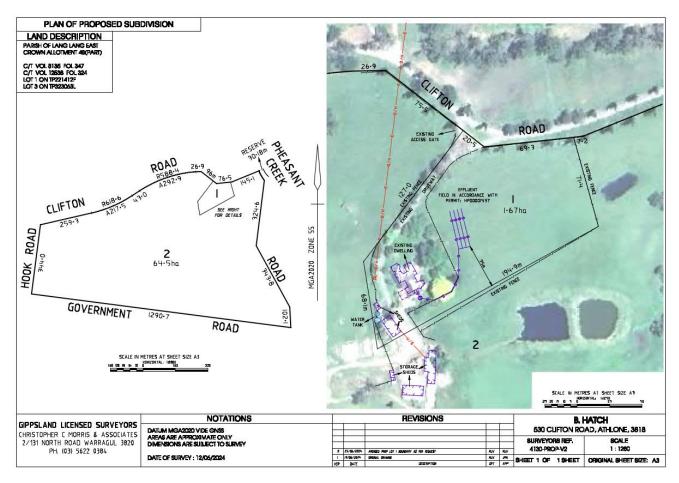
PLAN OF PROPOSED SUBDIVISION TO BE ENDORSED UNDER THIS PERMIT
